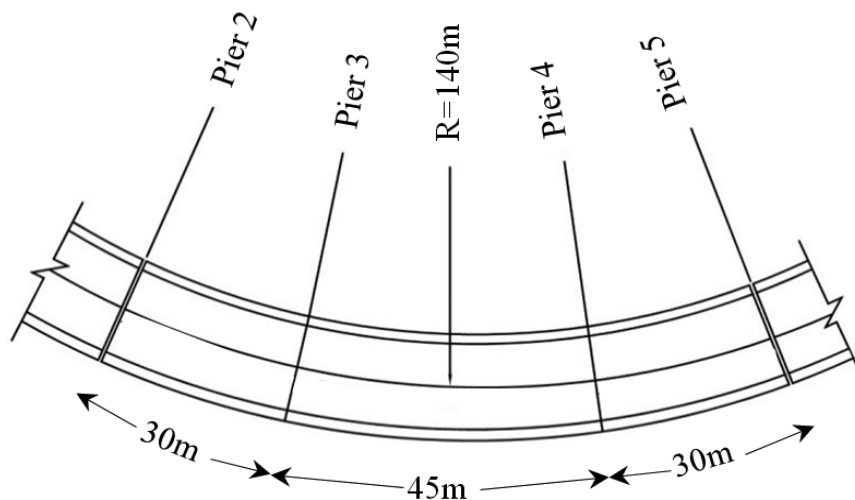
Plan view of the Ghale Morghi bridge, Tehran, Iran
